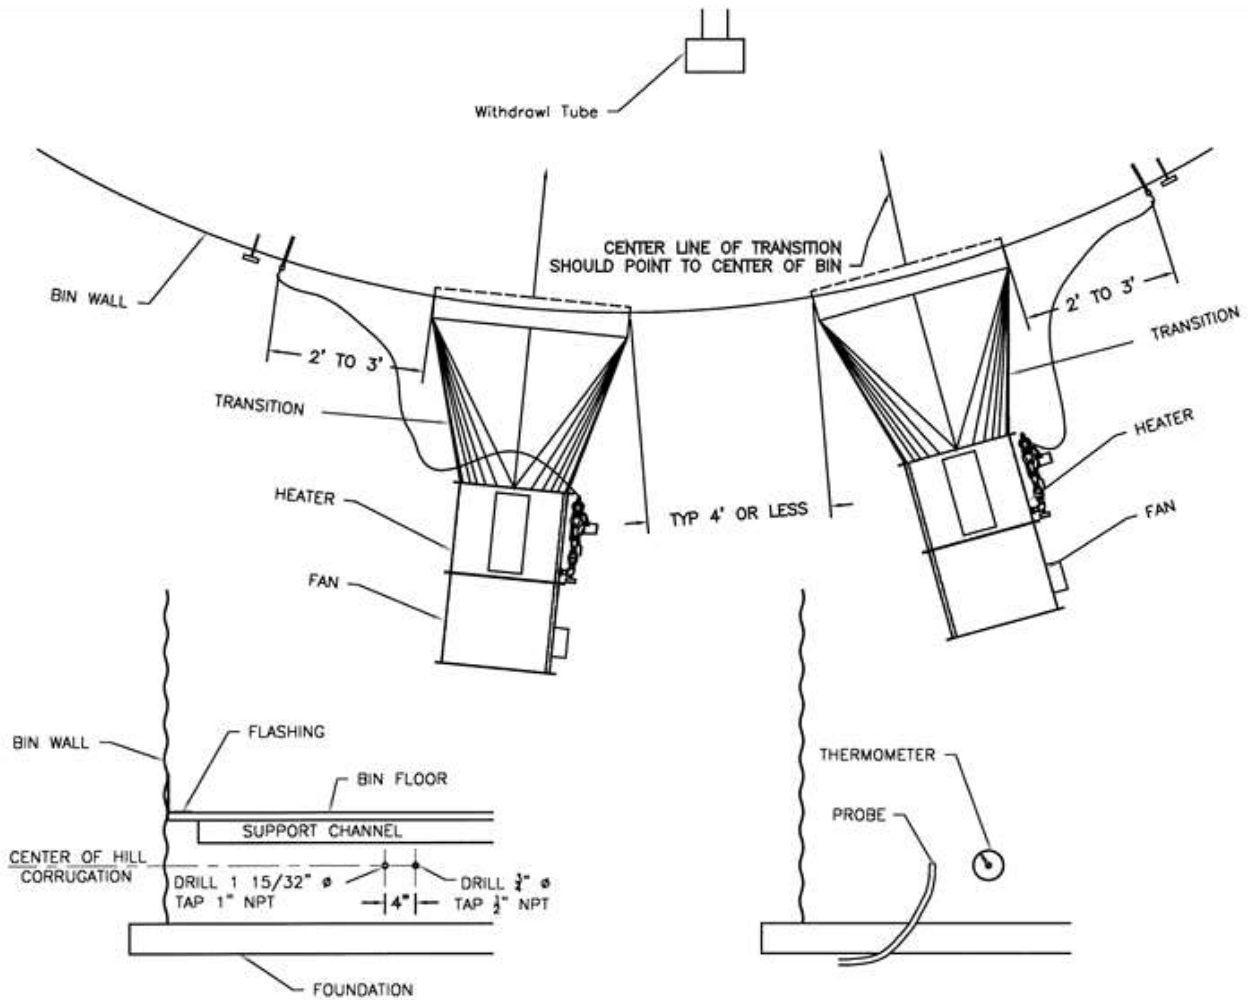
HEAT SENSOR AND THERMOMETER LOCATION FOR TWO HEATERS EACH WITH A MODULATING VALVE
